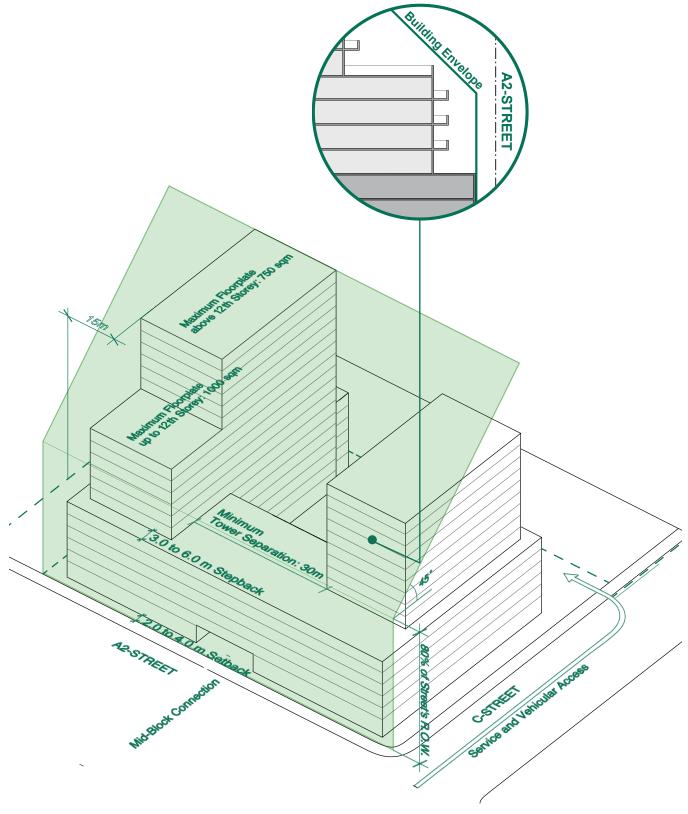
Frontage on an A2 Street with tower separations, setbacks, angular plane and floor plate size requirements indicated.
